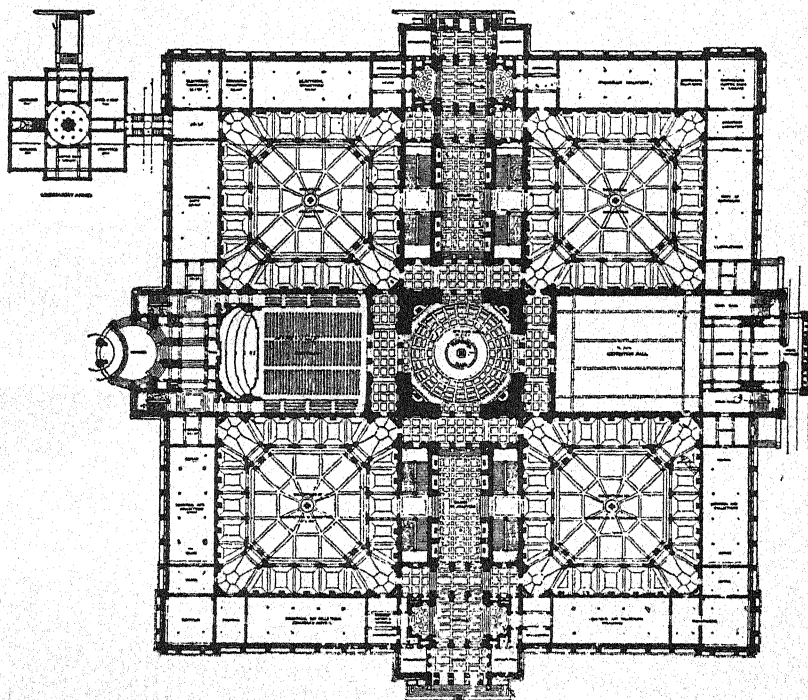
Brooklyn Institute of Arts and Sciences. Plan of first floor of the projected building.
